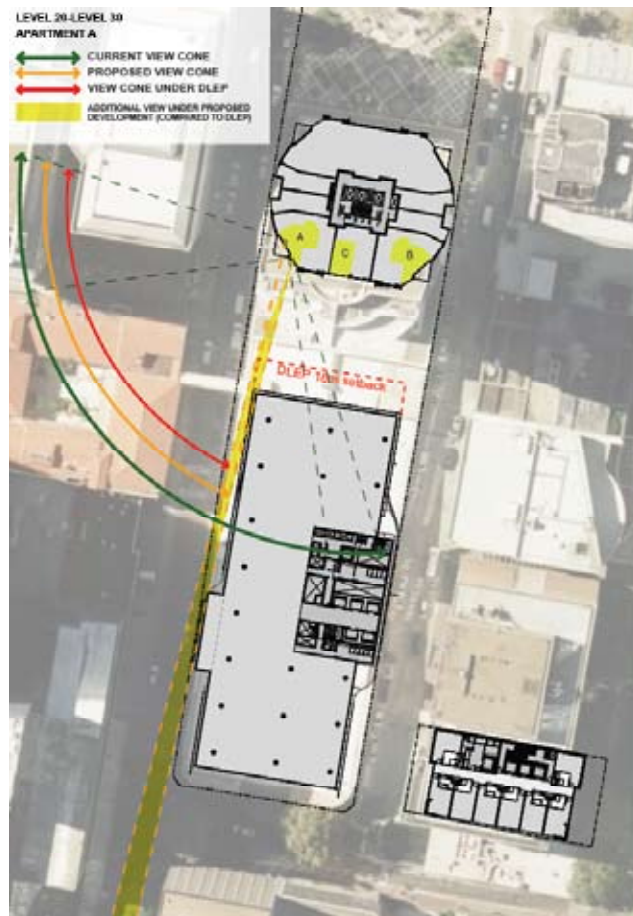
Additional view corridors preserved by proposed building envelope to south west
